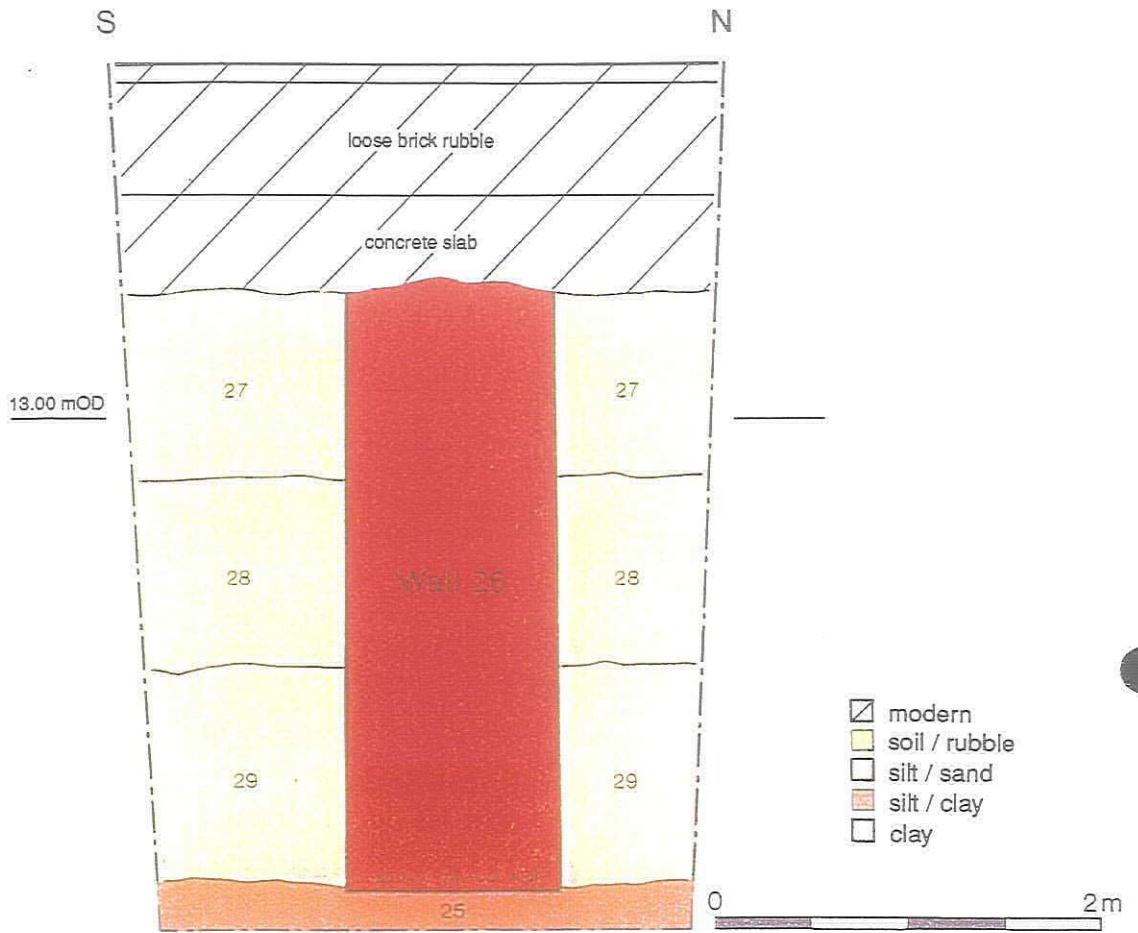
, East facing section of TP11. Shows east-west aligned soft red brick prison wall [26], within later backfilled construction trench
